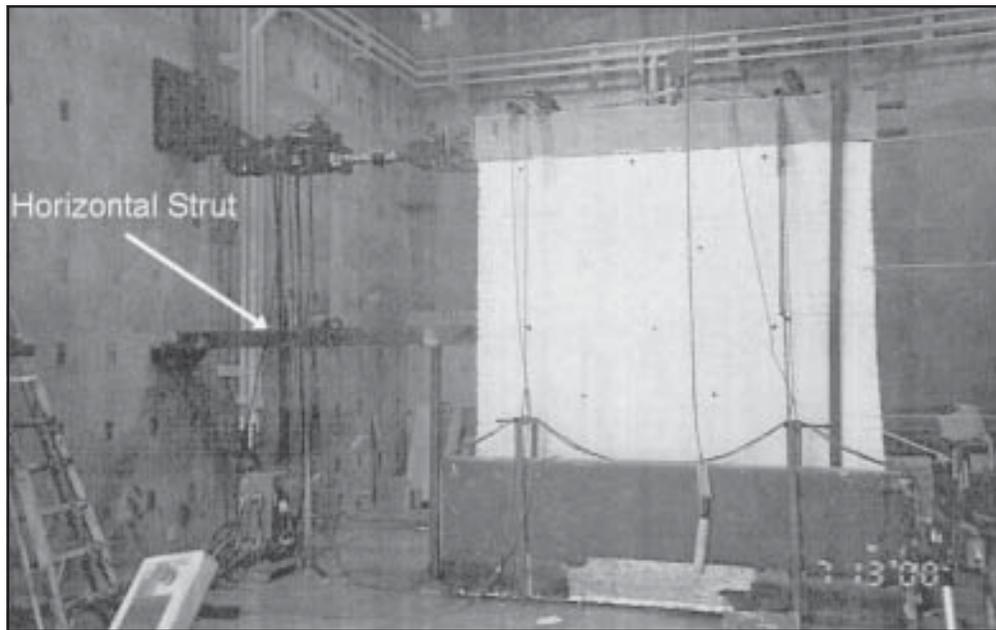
Test Setup of the In-Plane Laterally Supported Wall with Horizontal Strut Along with Extra Suspended Axial Load and Anchored to Foundation with Fiberglass and Steel Chain
